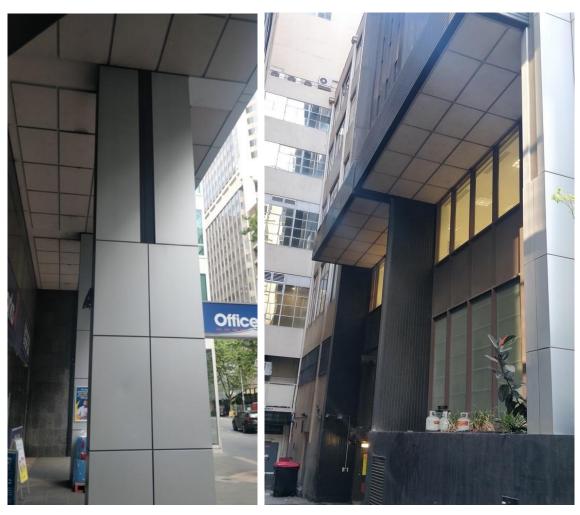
Later metal cladding to the columns. Note the original soffit lining remains but partly infilled, and sections of the original ribbed cladding are visible. Source Trethowan Architecture, 2021.
